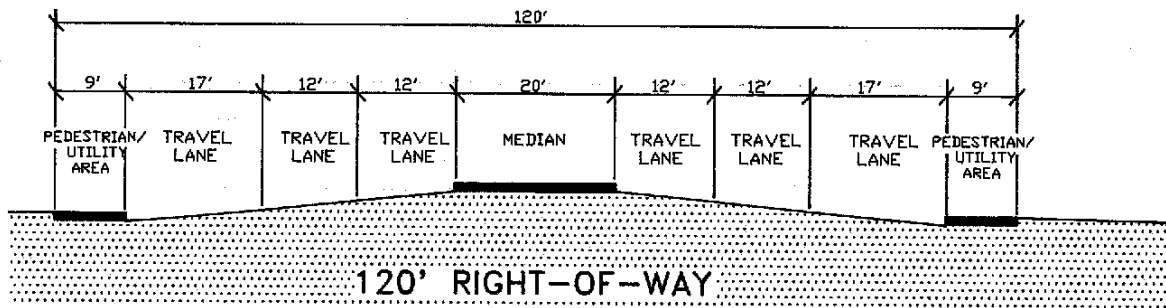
A typical high volume arterial cross section is shown in this figure, consisting of six travel lanes, a raised median with storage for turning vehicles and areas on each side for sidewalks, utilities, and street furniture. Seventeen feet has been allotted to the outside travel lane to allow adequate space for bicycle traffic next to the curb.
